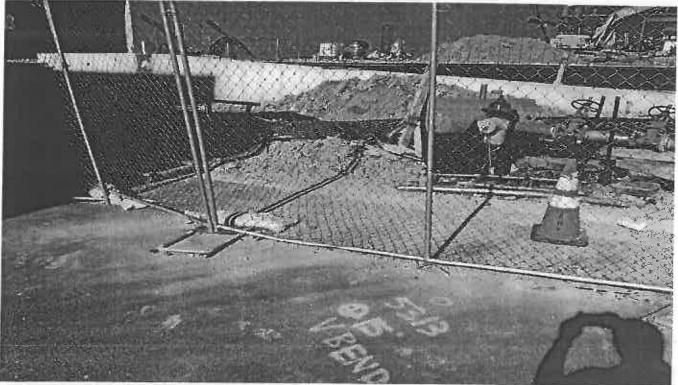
Super Silt Fence overwhelmed with pile of sediment North of the site
